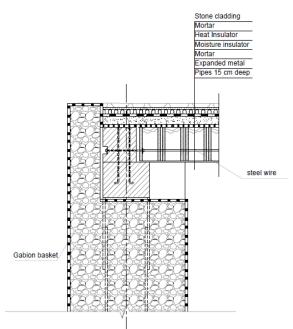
Recast slab from pipes. section B-B. Source: Designed and drawn by the author
